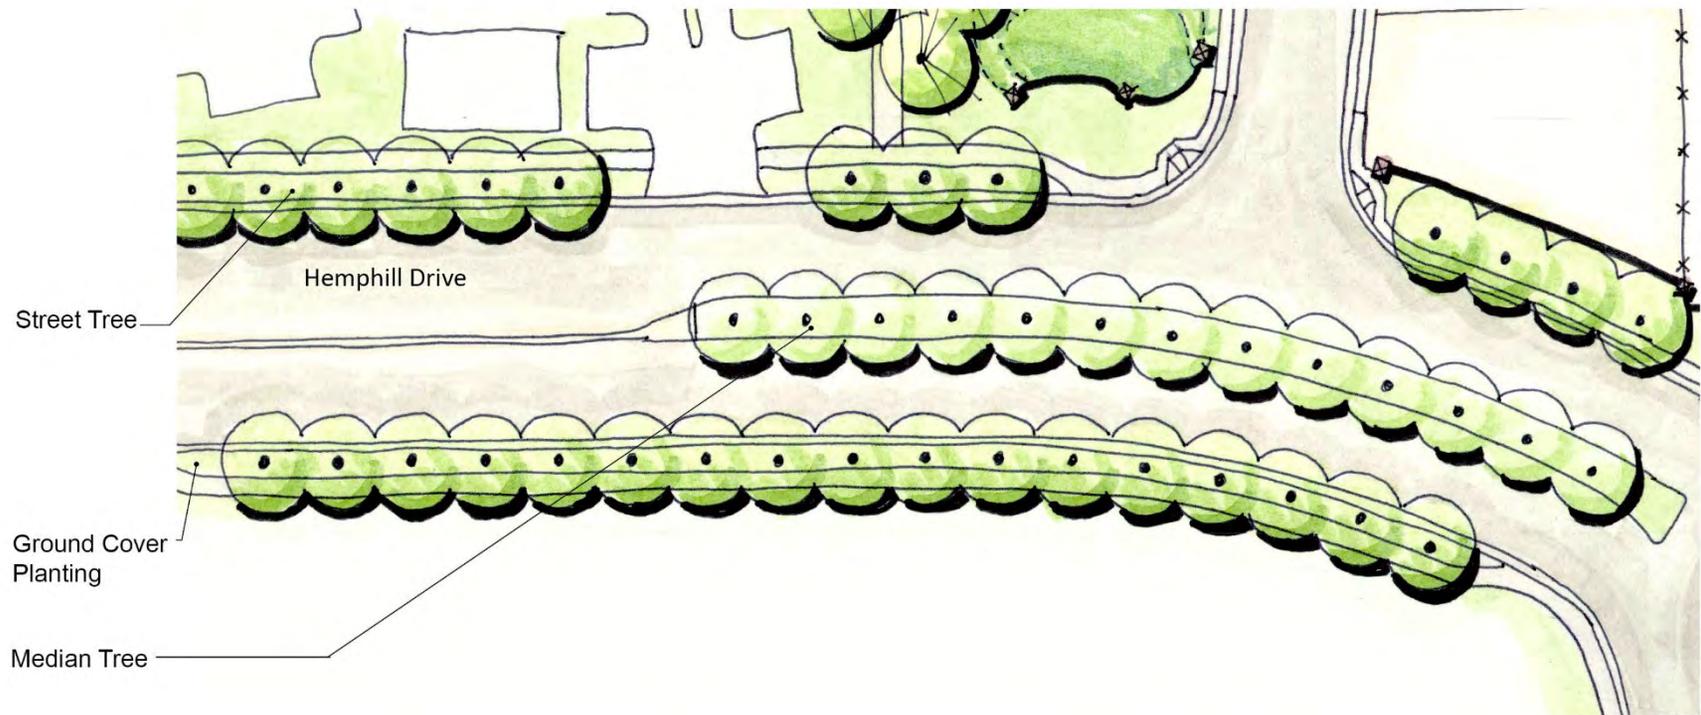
Hemphill Drive Plan View – 14' Median
